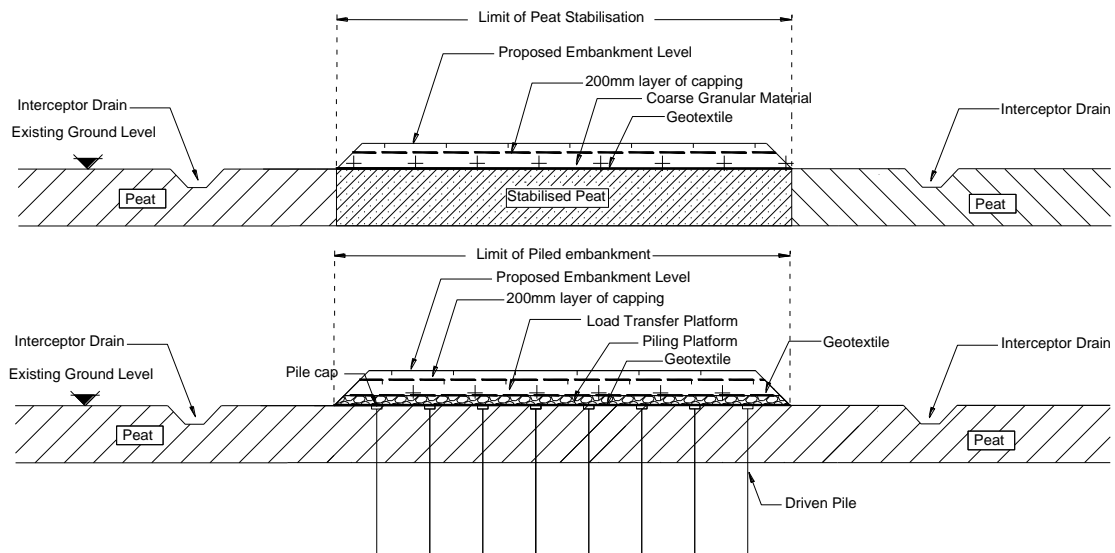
(a) Typical cross sections of a stabilised embankment and (b) typical cross sections of a piled embankment
